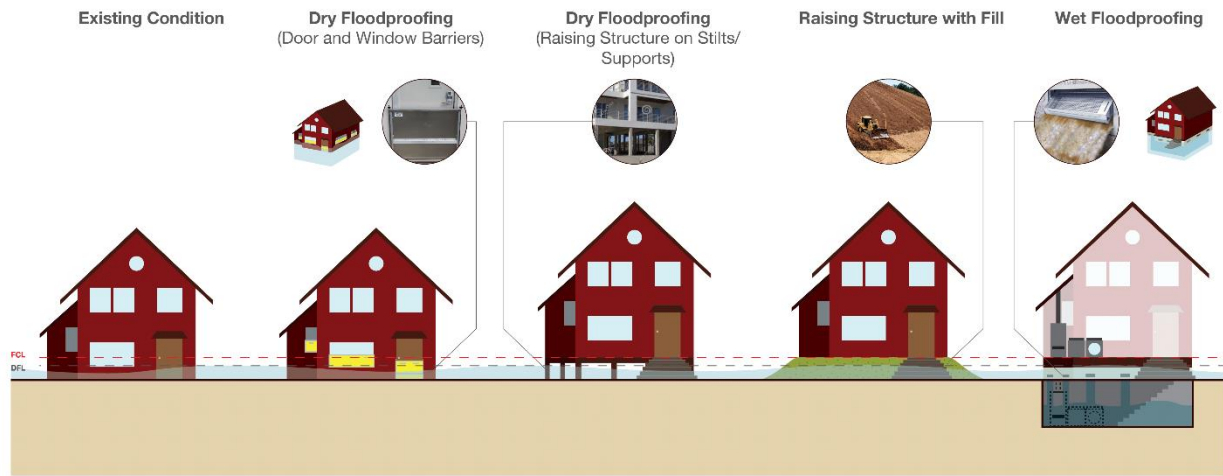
Building floodproofing schematic (FBC, 2020)
